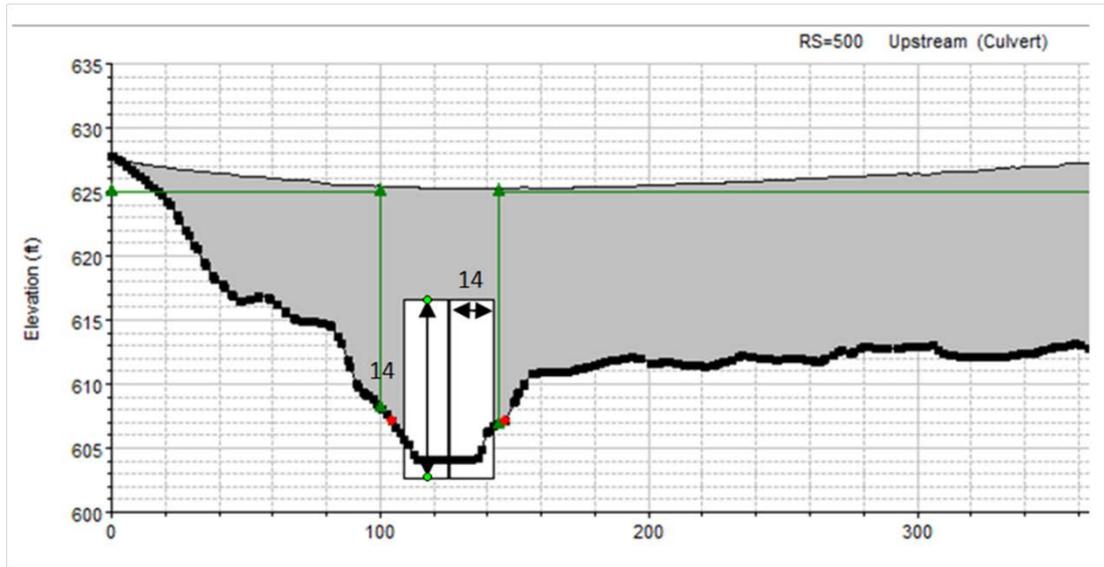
Upstream Cross-Section of the Base Case Design for Culvert 5648
